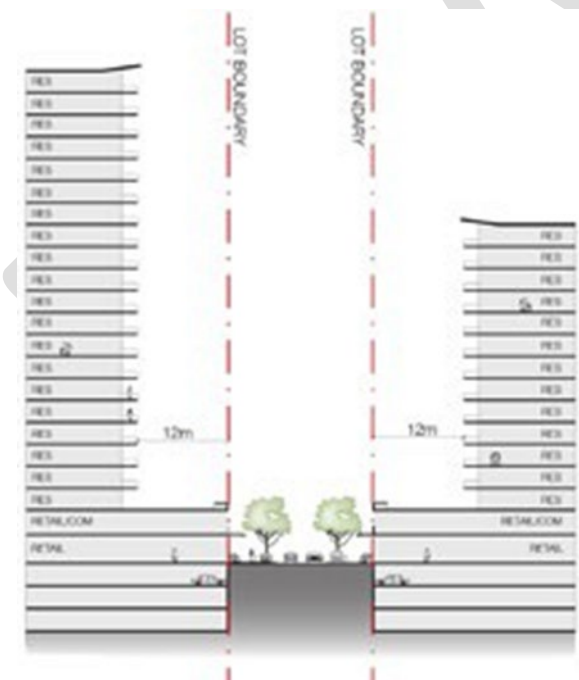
East Precinct – Illustration of Building Height and Street setbacks along Oxford Street
